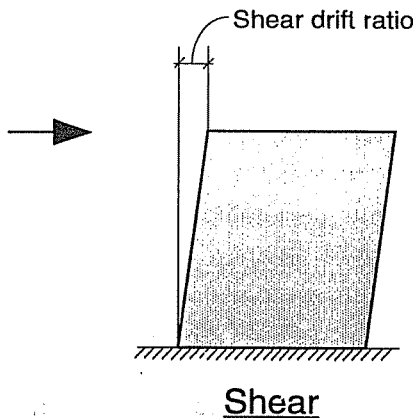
Shear Drift Ratio for Walls and Wall Segments Governed by Shear
